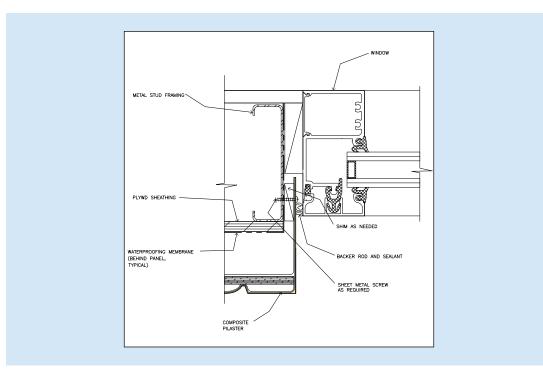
Section view: FRP panels with steel support and window – Type 3
